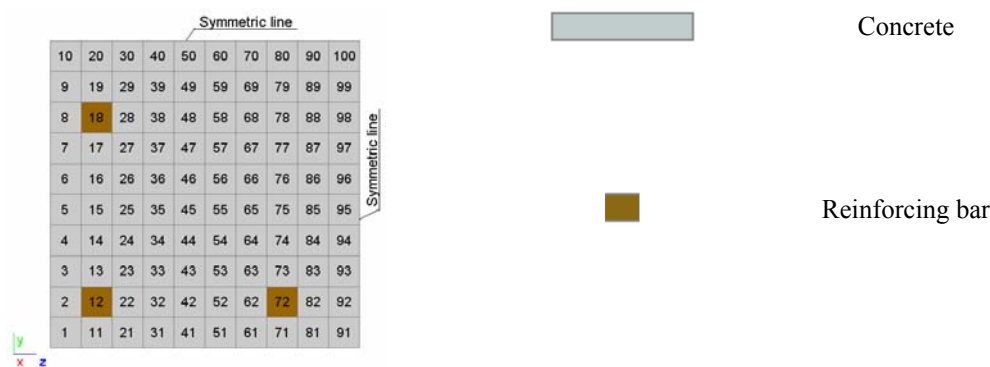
Cross-section of a column in SAFIR structural analysis
